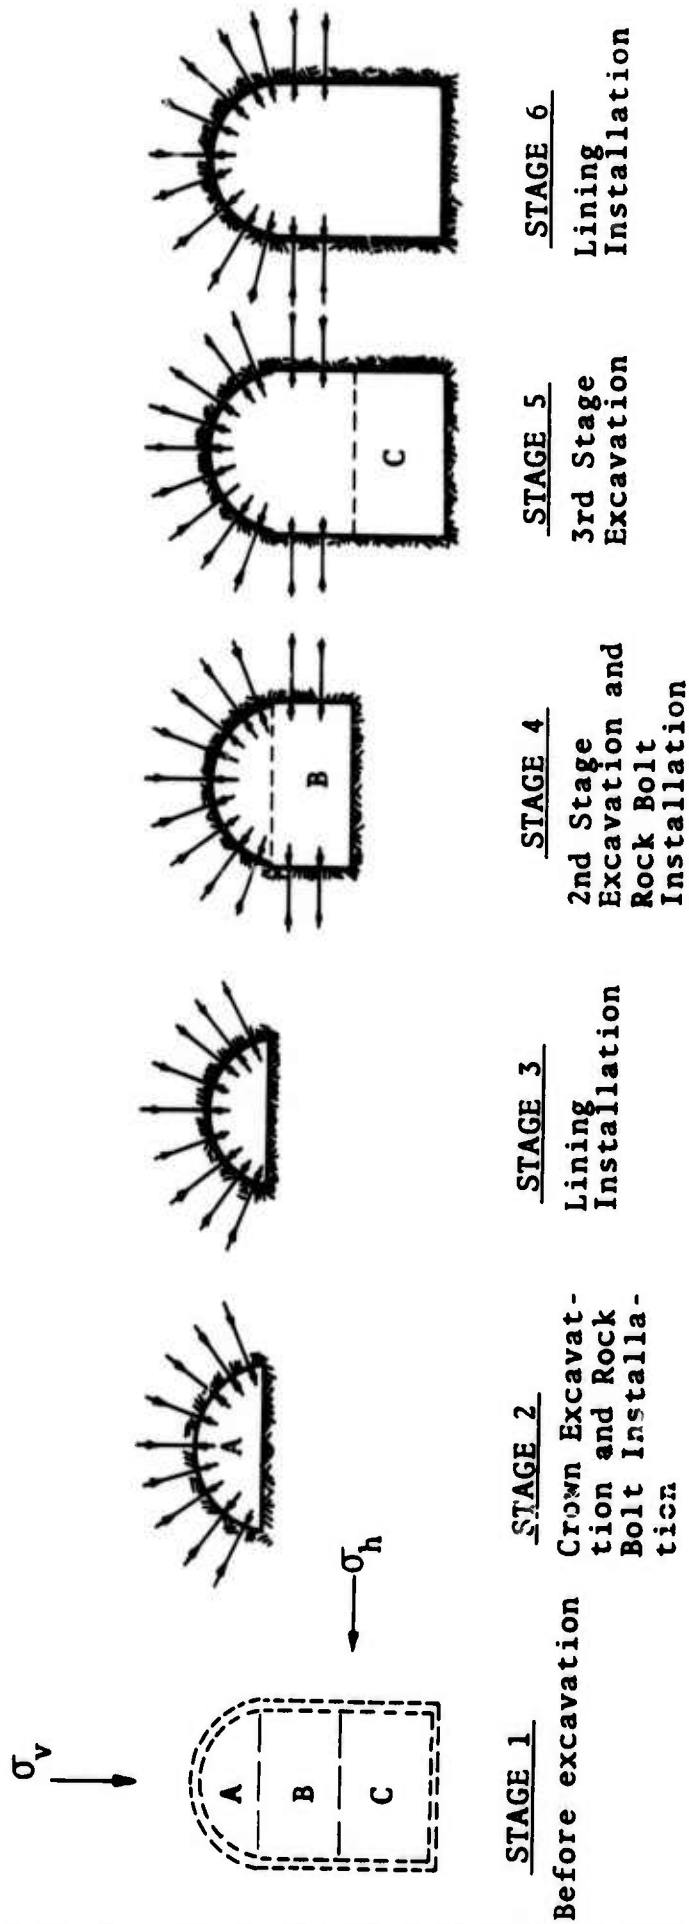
A SCHEMATIC DIAGRAM SHOWING EXCAVATION, CONSTRUCTION SEQUENCES AND GROUND SUPPORT INSTALLATIONS DURING CONSTRUCTION OF AN UNDERGROUND OPENING
